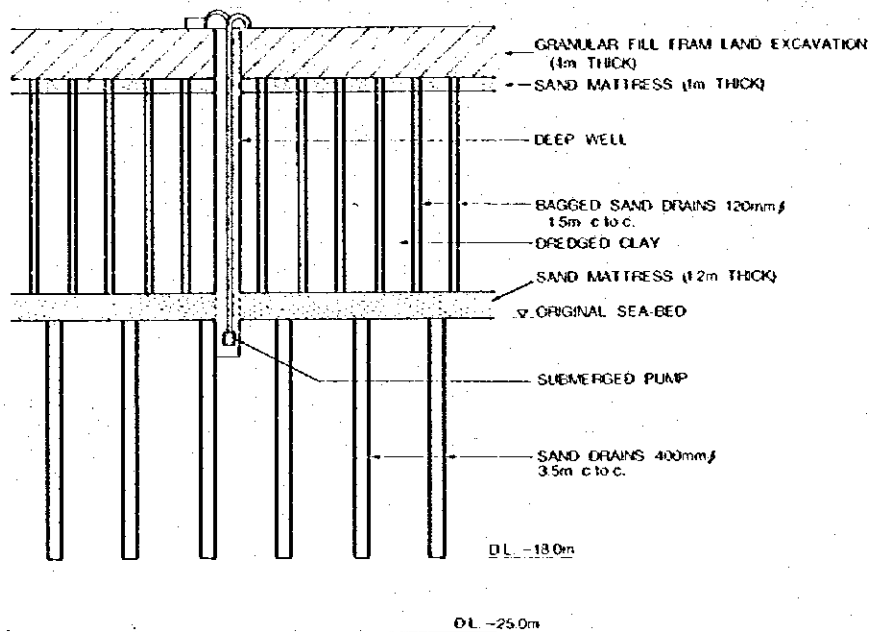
Subsoil Improvement by Sand Drains, Bagged Sand Drain and Deep well
